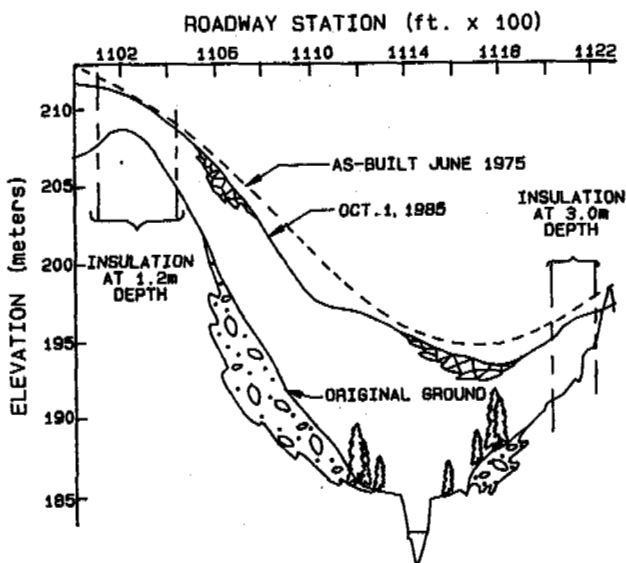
Road centerline elevation profiles in 1975 and 1985 across Alder Creek valley.
